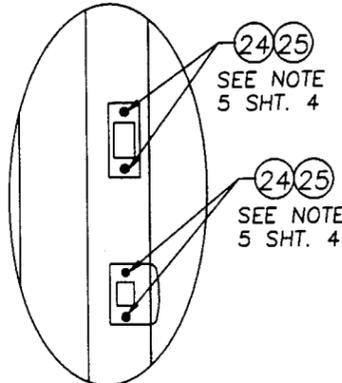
DETAIL F WINDJAMBER ASTRAGAL RETAINER BOLTS HEADER STRIKE PLATE & OPTIONAL SURFACE BOLT STRIKE PLATE
